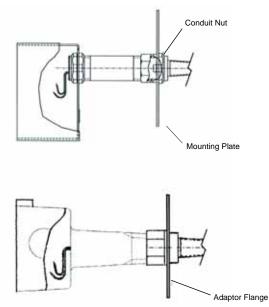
Mounting Duct Sensor Using Existing Mounting Plate.
